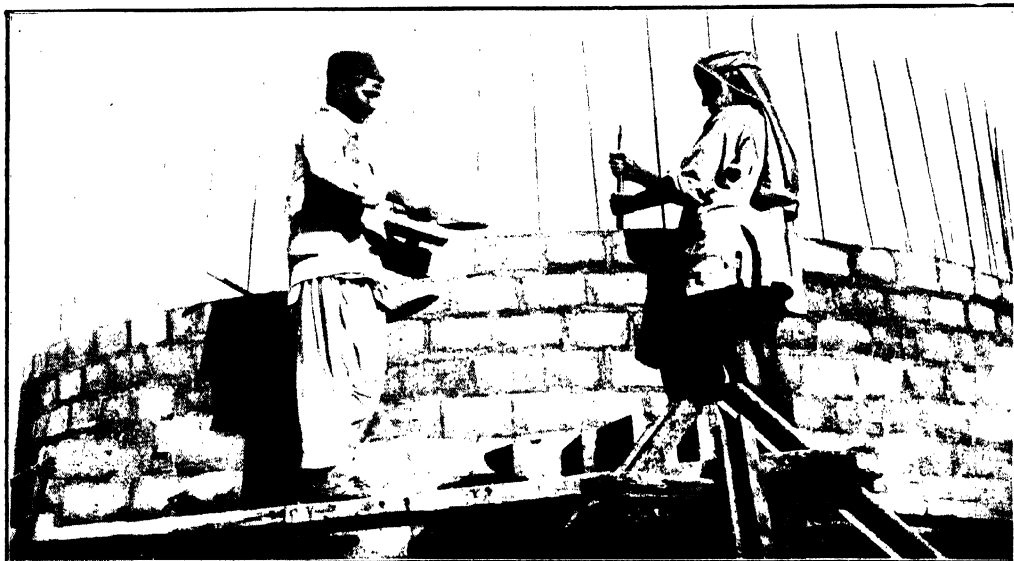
Circular water tank under construction. The wall is nine inches thick.
